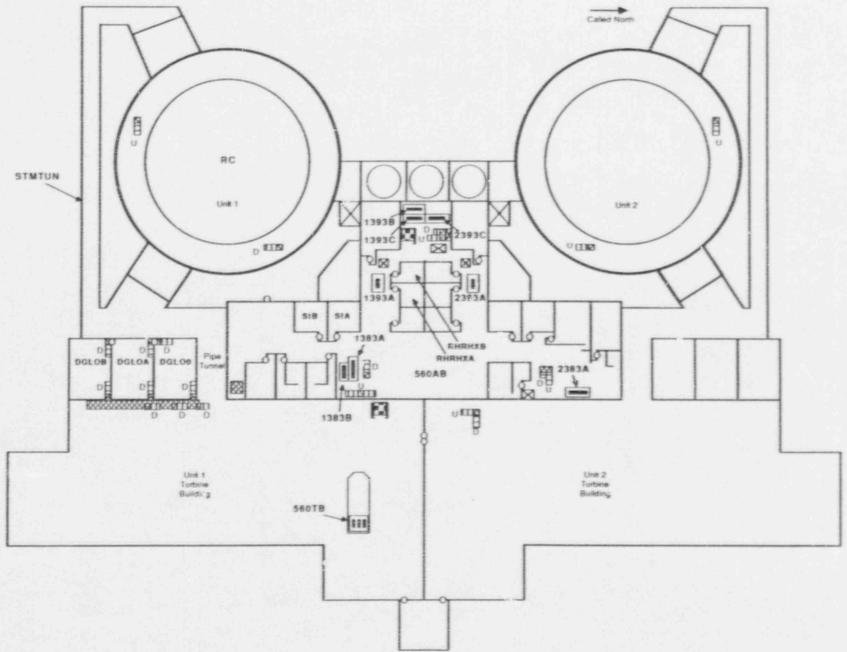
Zion 1 and 2 General Arrangement, Elevation 560'
